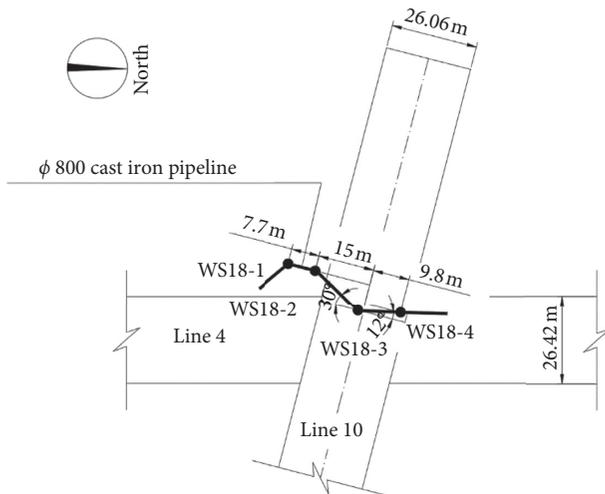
Monitoring point layout of the ϕ 800 cast iron water pipeline.
